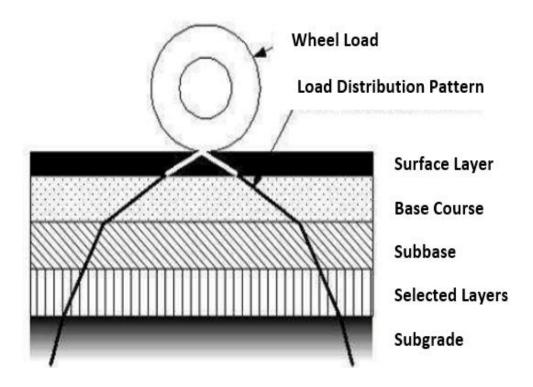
Load distribution of flexible pavement (Adlinge and Gupta, 2013).
